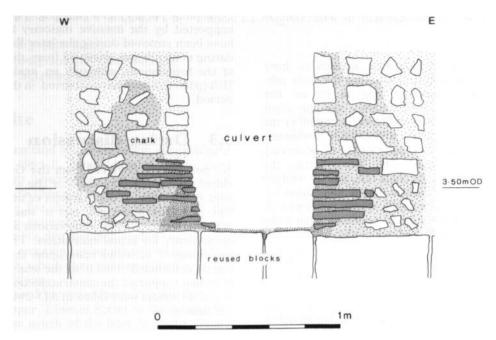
Sunlight Wharf; cross-section through the culvert in the north-south foundation in Trench BX. It was constructed as an integral part of the foundation, initially with tile courses and then with ragstone facing to the foundation core. (1:20)
